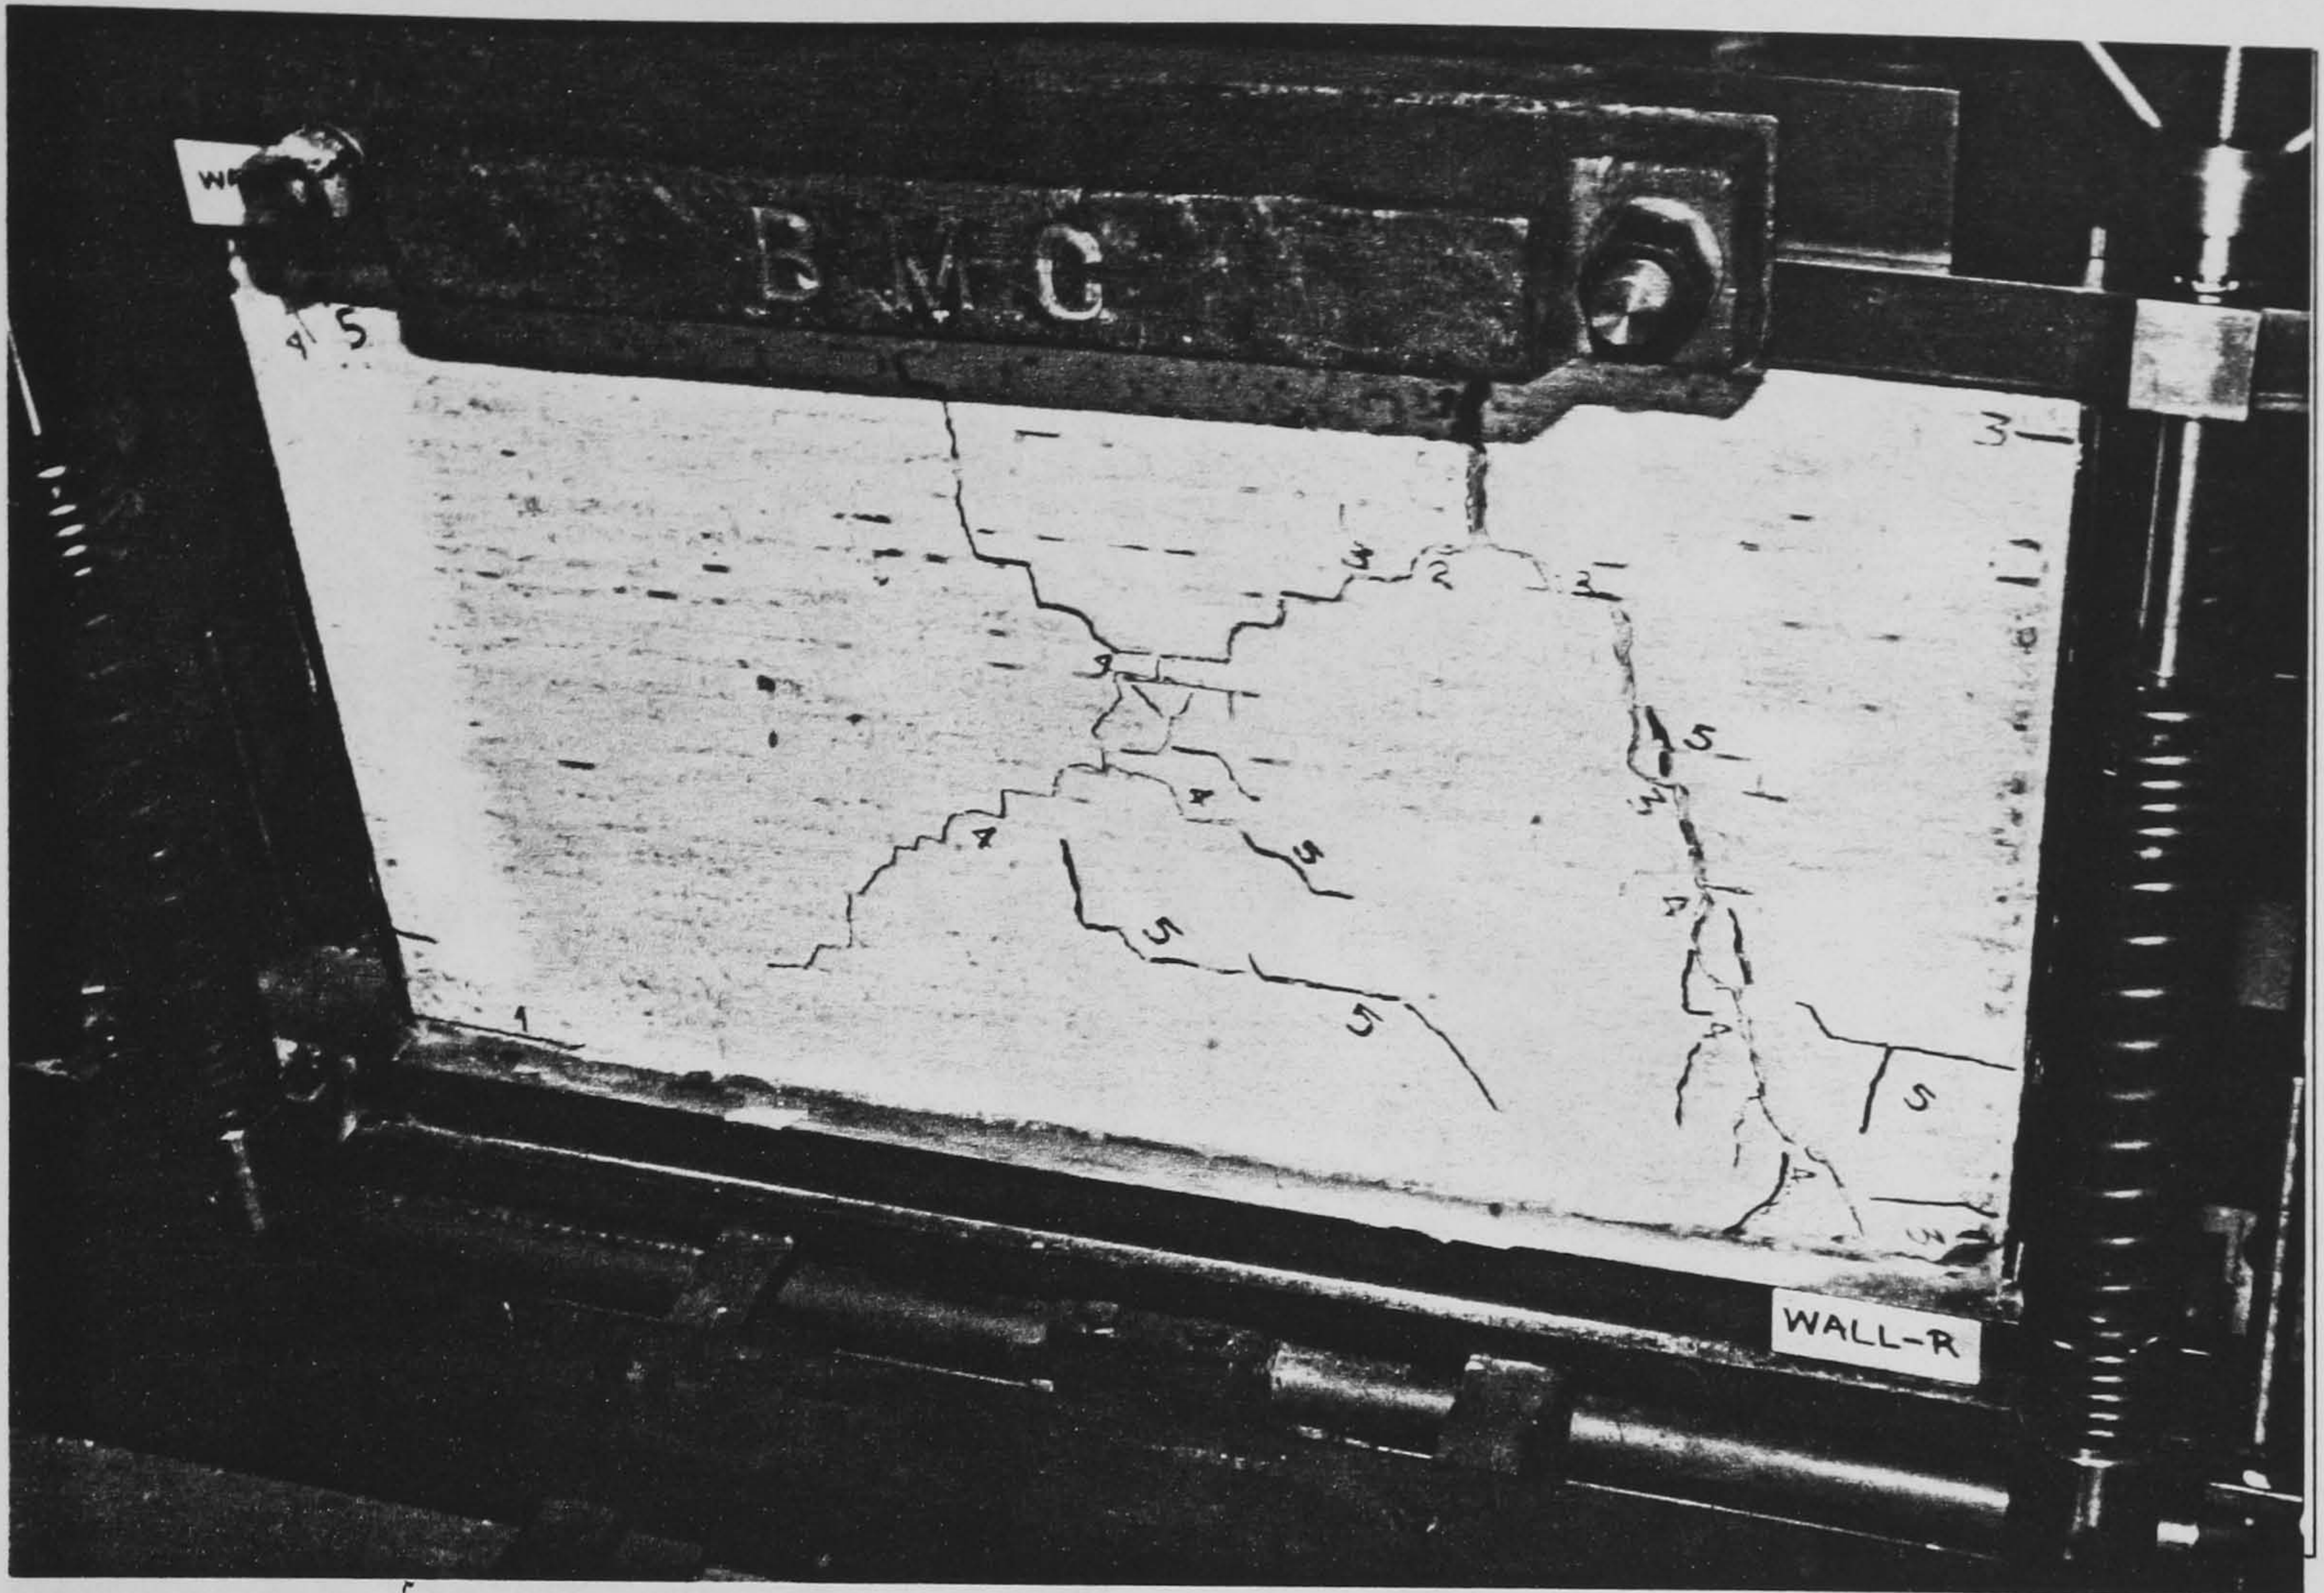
Collapse sequence-frame 1 (wall-R)
